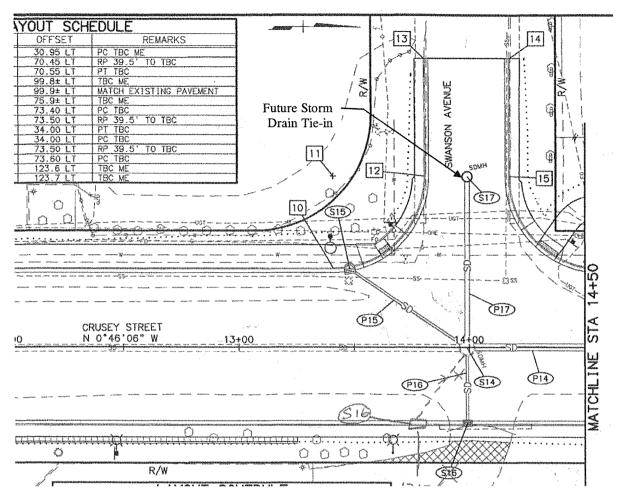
Storm Drain System at the Intersection of Swanson Avenue & Crusey Street
